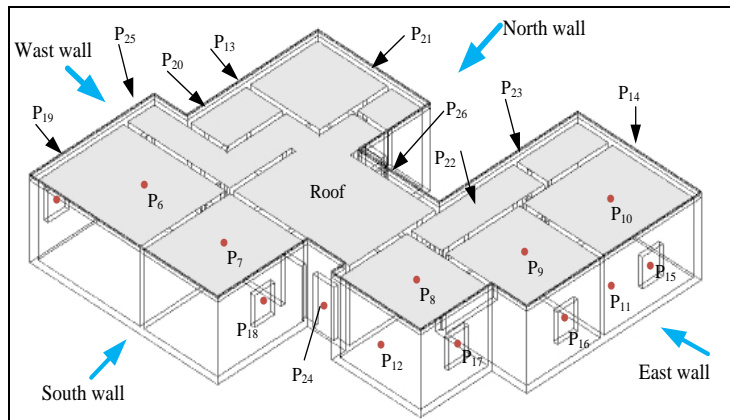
Outside Surface of Roof, Vertical Wall, Windows and Doors: 26 Points
